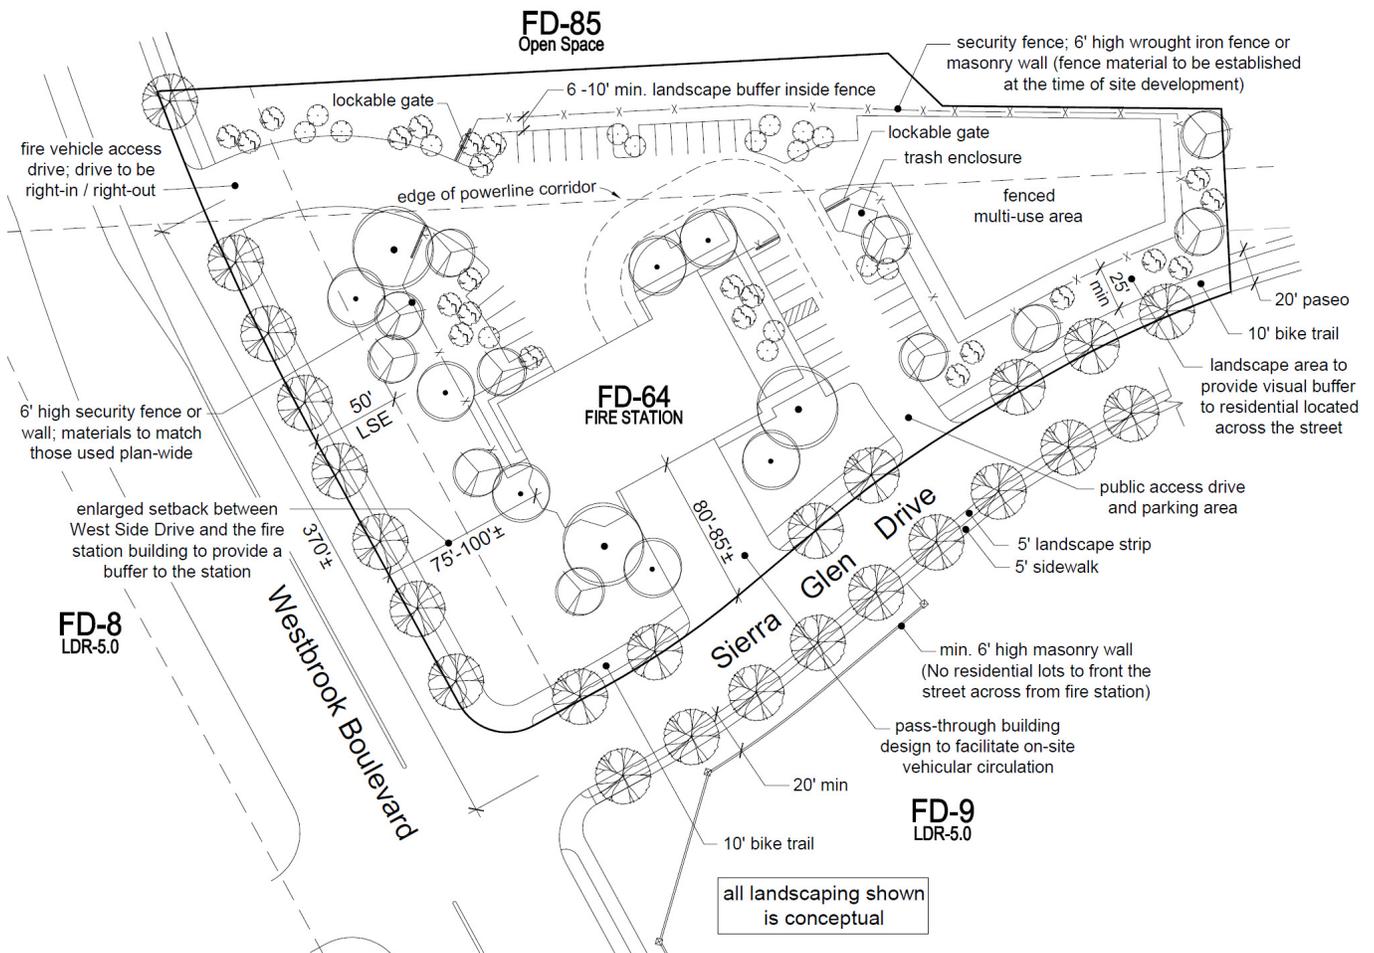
Fire Station Site Concept Plan (Parcel FD-64)
